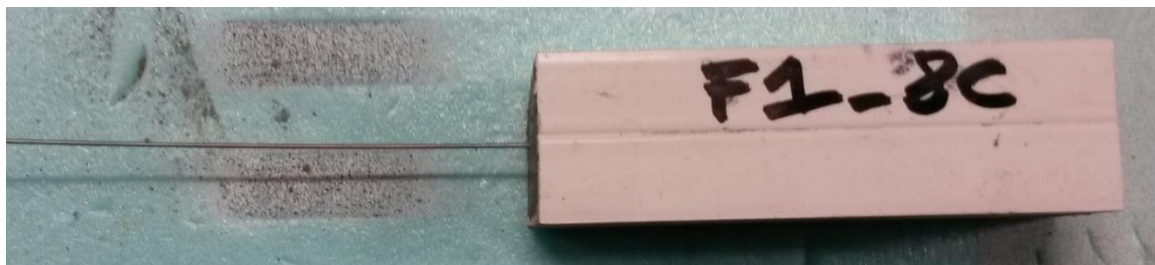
80 mm pull-out specimen after cutting, containing 1 wire.
